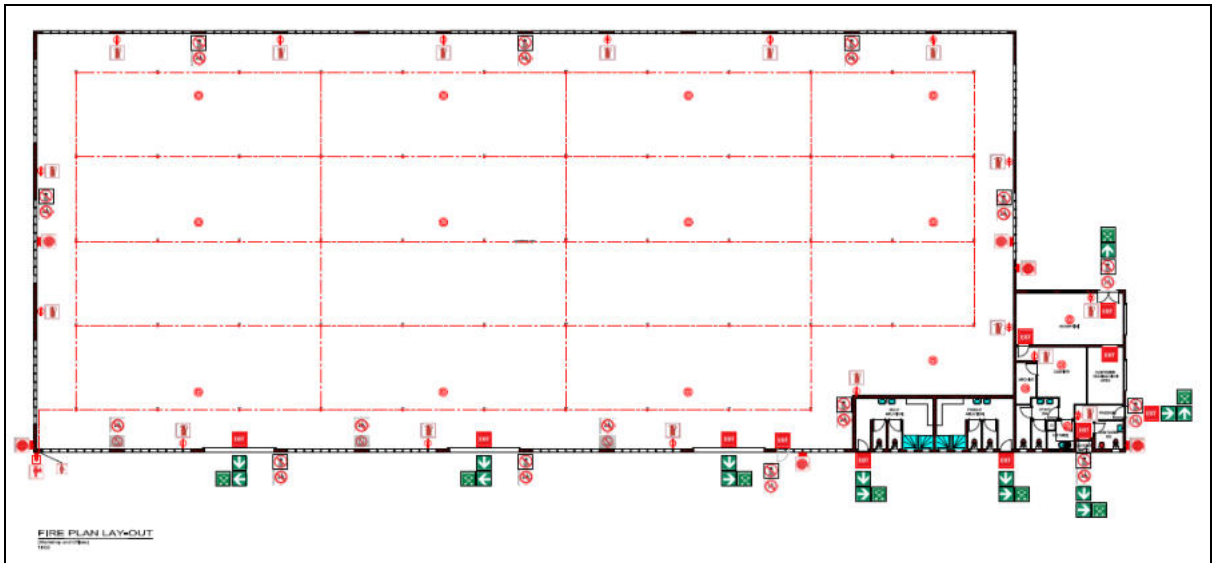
Fire Plan Layout for the Workshop and Offices (obtained from D Gallagher, 2025)
